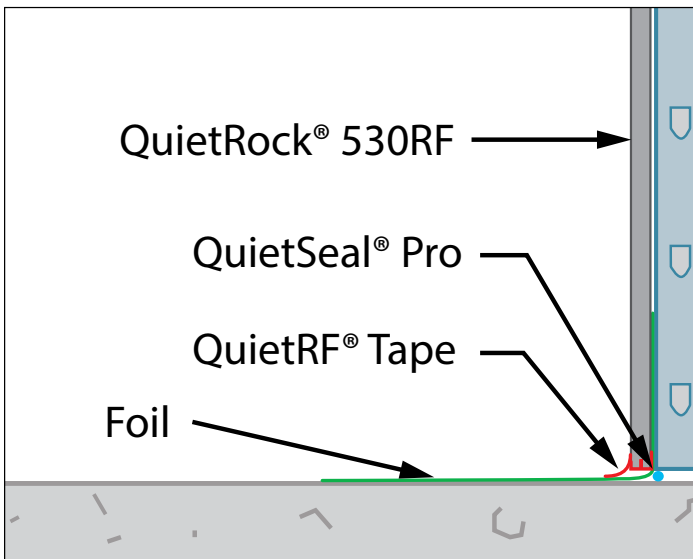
Inside Corner QuietRF® Shielding Tape application at floor
